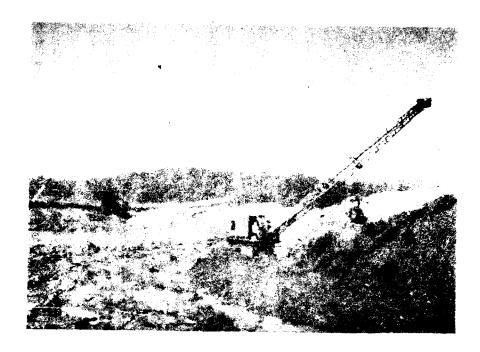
Dragline cleaning east ditch (July 9, 1984)
